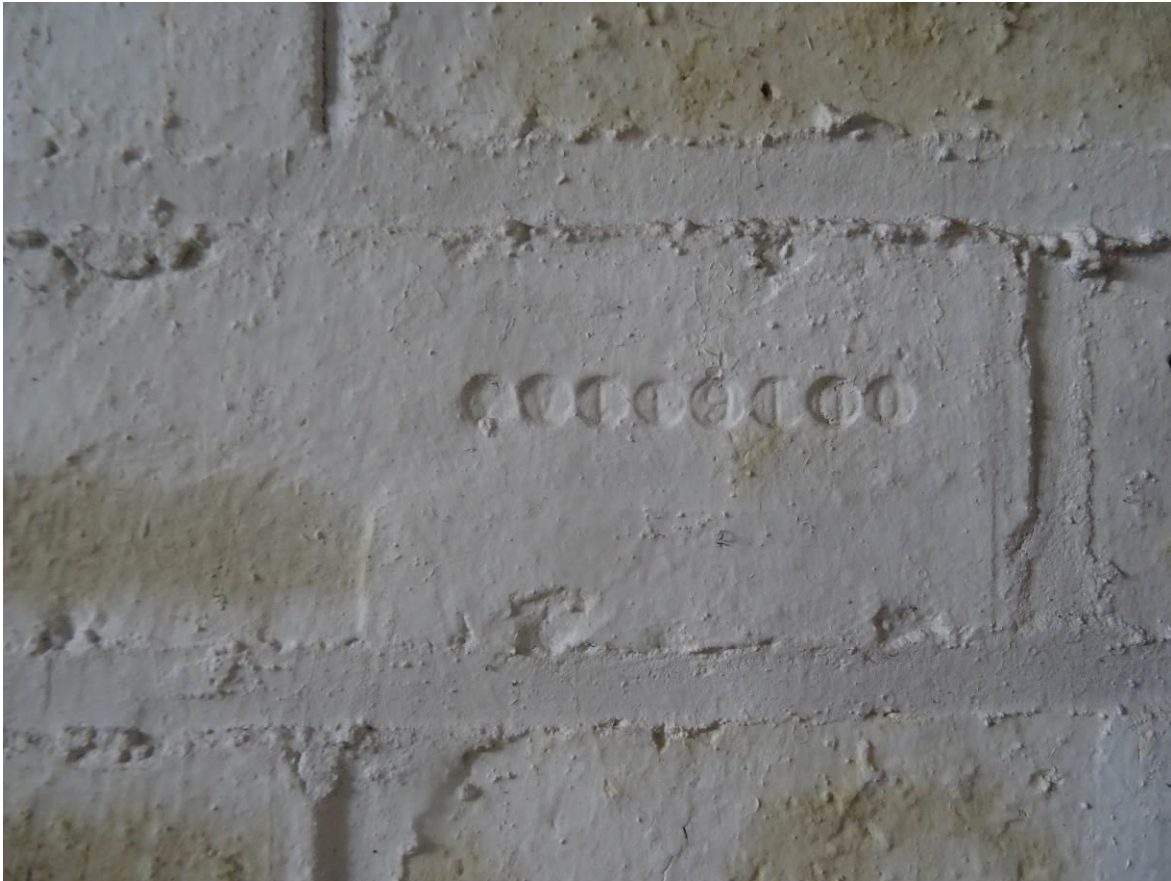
Brick codes found on brickwork belonging to the external wall of a former canteen – see Plate 41
